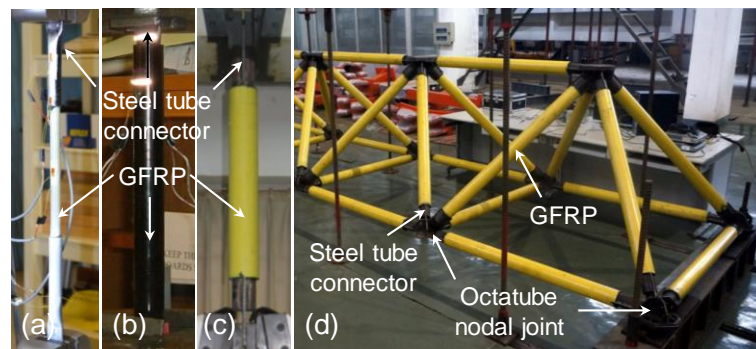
Bonded sleeve connections for: (a) specimens G1&G2; (b) specimens G3&G4; (c) specimen G5; and (d) an assembled large-scale space frame.
